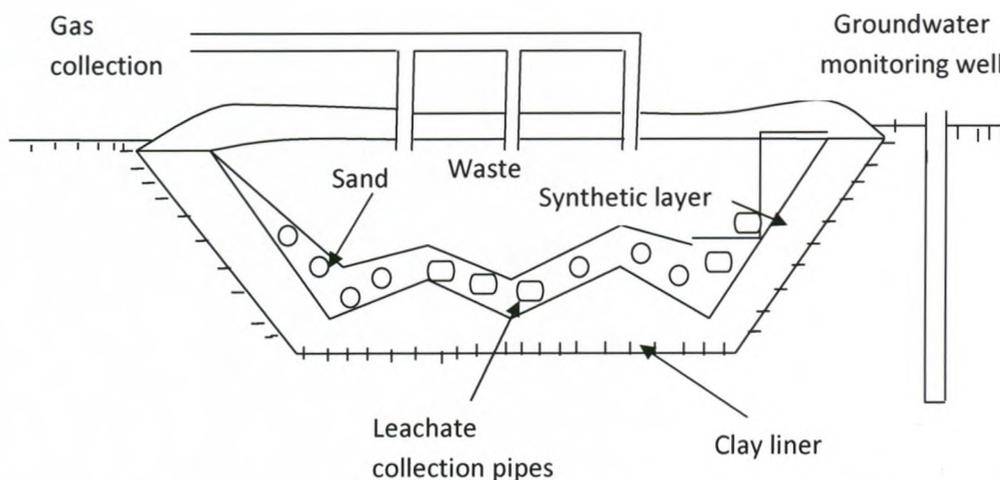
Cross section of a typical municipal solid waste landfill (Source: Masters and Ela, 2008)
